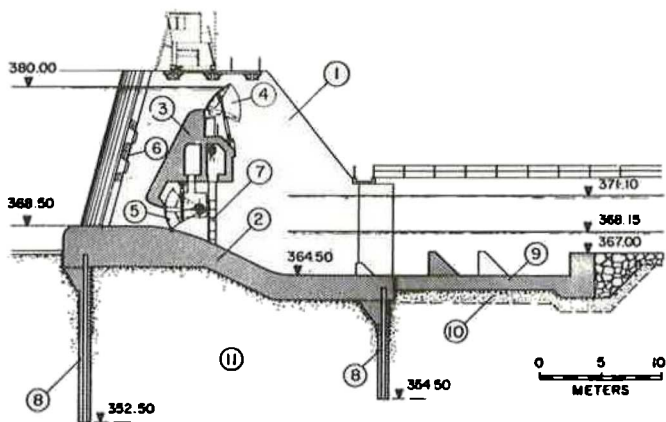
LONGITUDINAL SECTION OF A SPILLWAY BAY
